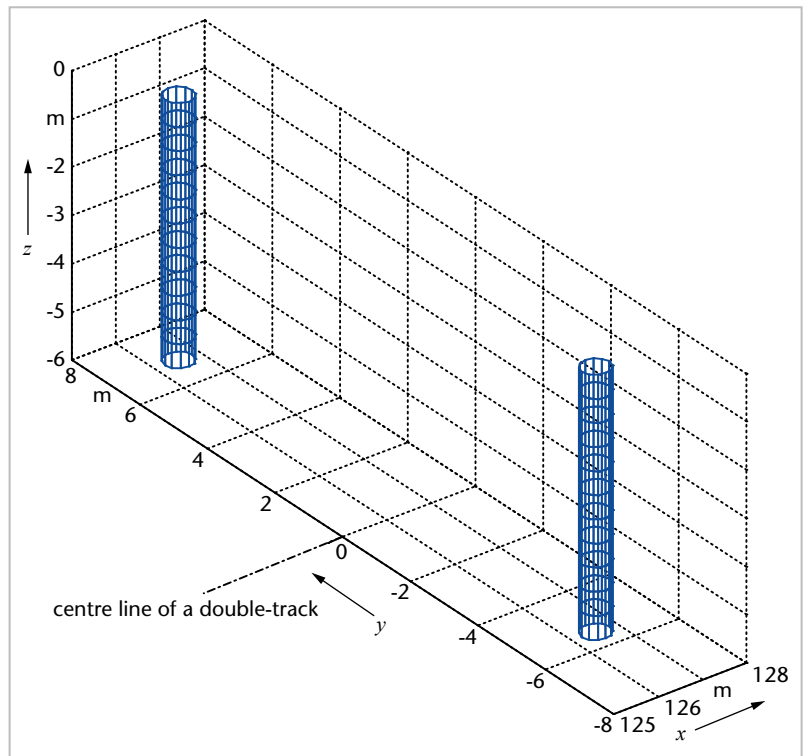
Modelling of piling pipe foundations of masts in EMM.
